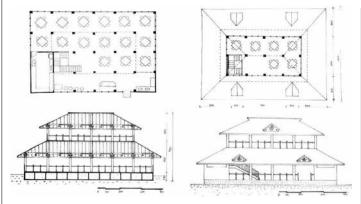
Plan, elevation and section of Flotilla restaurant in Veli, Trivandrum, Kerala Source: Authors
